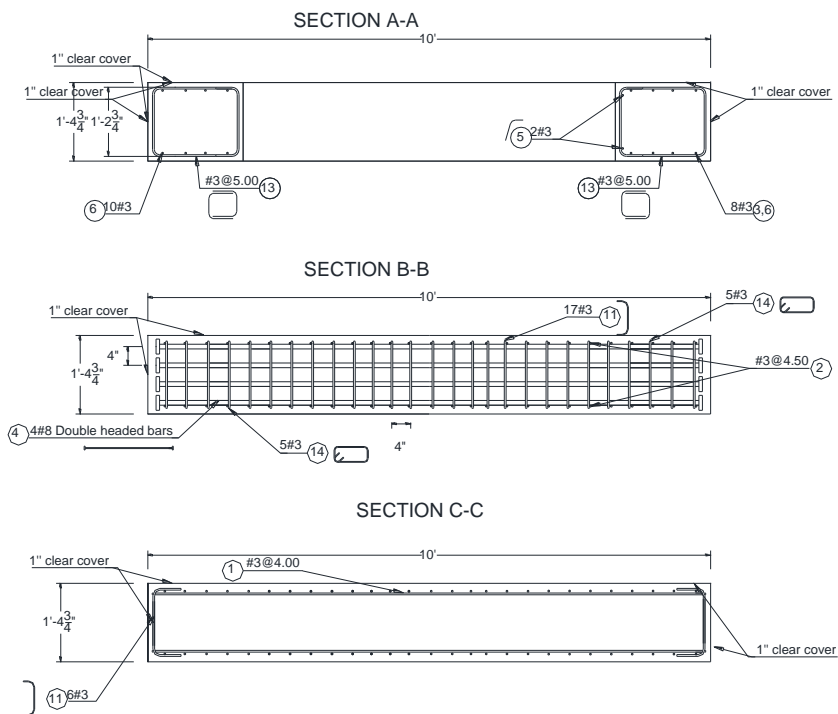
Sections A-A, B-B and C-C in design drawings for Specimen 9 (see Figure 6.6 for the location of the sections)
